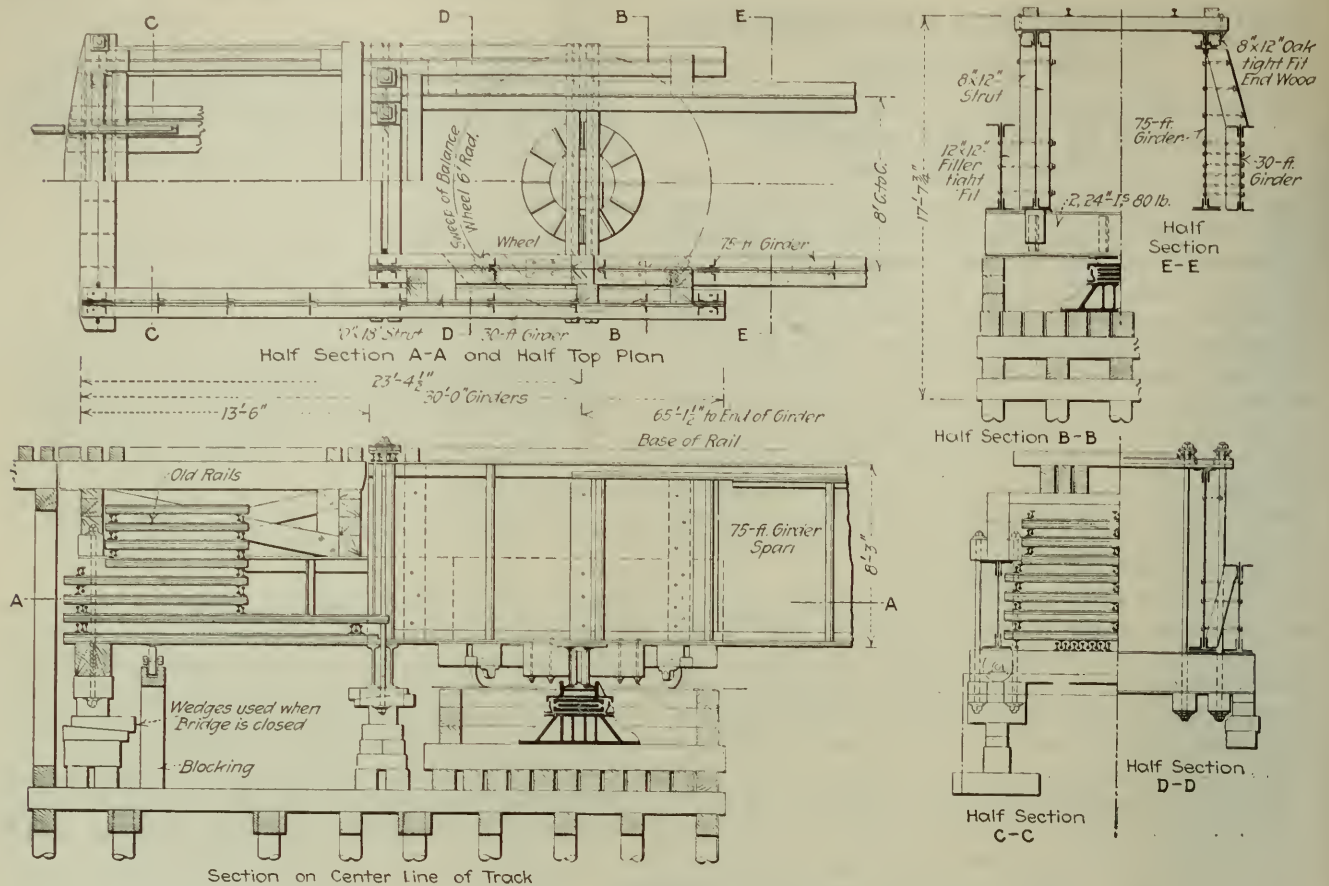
TEMPORARY SWINGSPAN BUILT OF OLD GIRDERS
